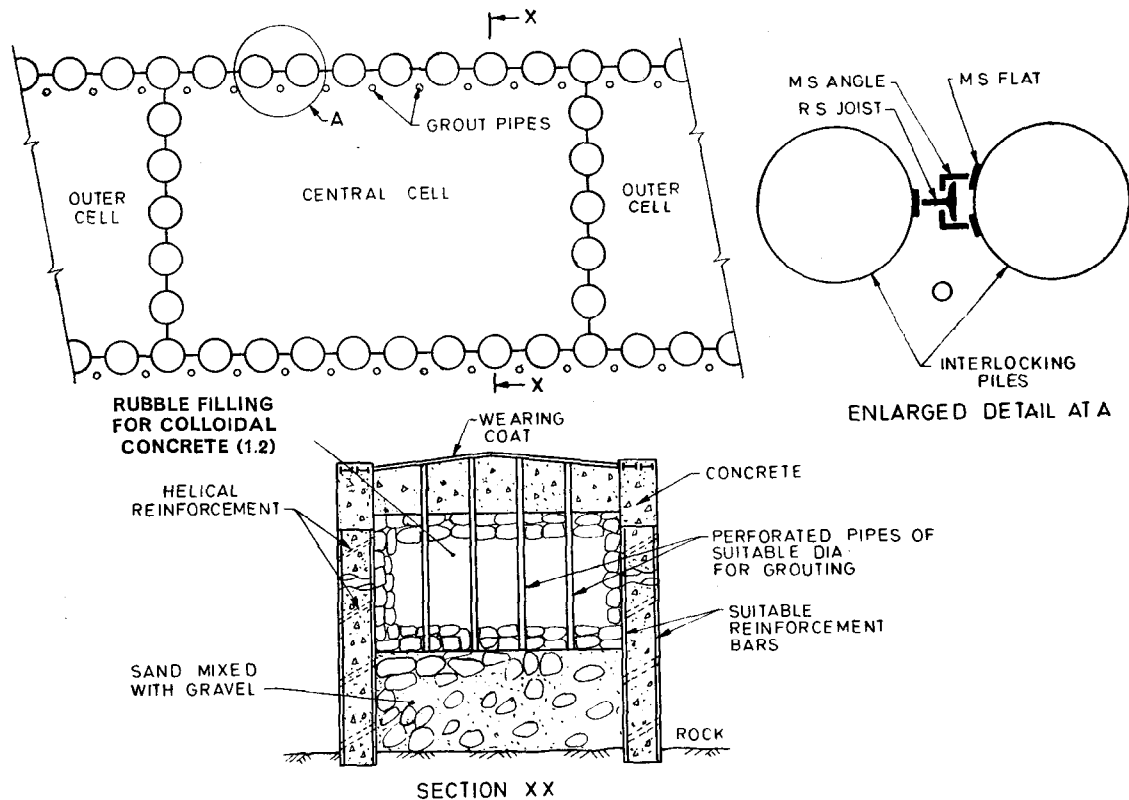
COLLOIDAL CONCRETE COFFER DAM
